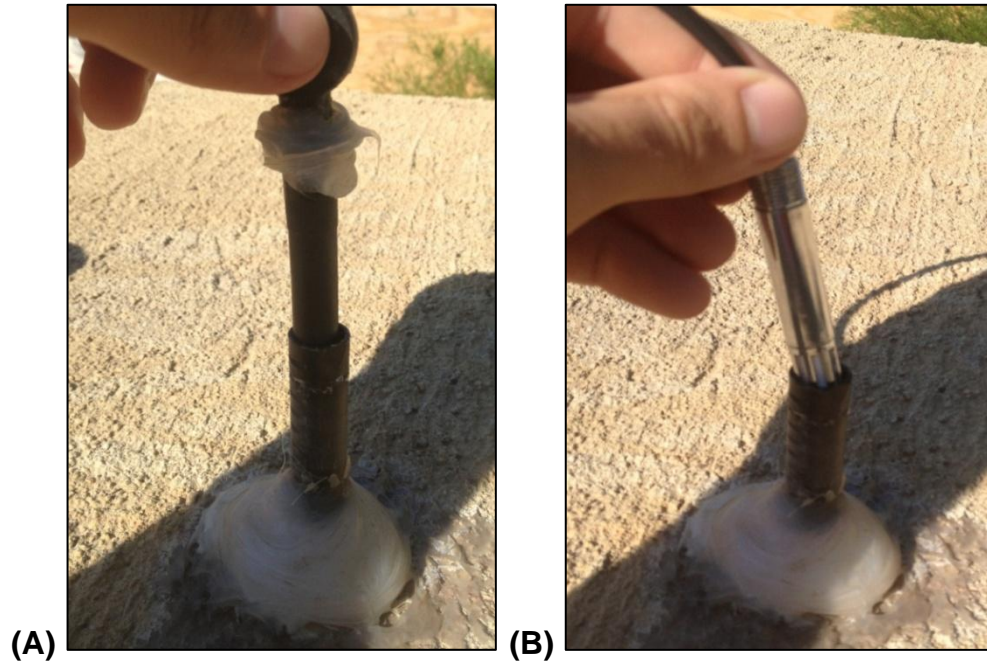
(A) Removing long rubber plug and (B) inserting probe into tube
